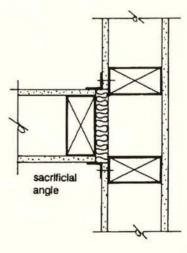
Typical details when timber framed partitions are required to be separated, e.g. in essential facilities.
